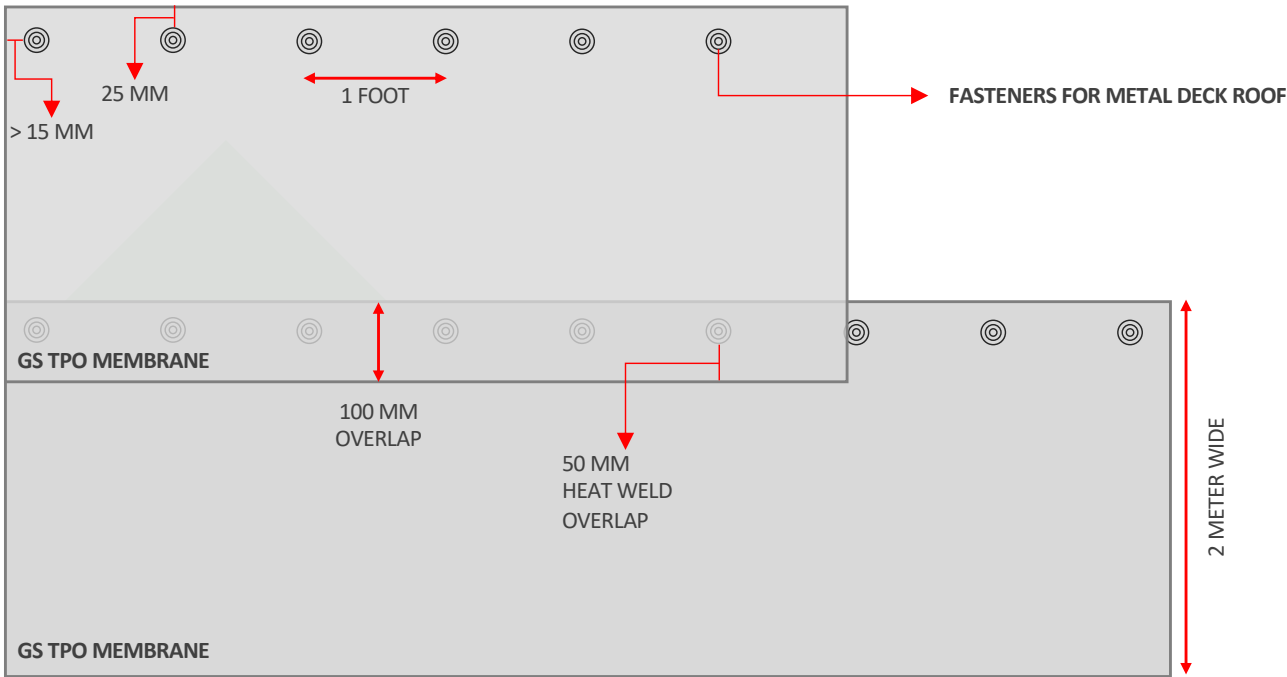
A: MECHANICALLY FASTENING MEMBRANE OVER INSULATION BOARD
